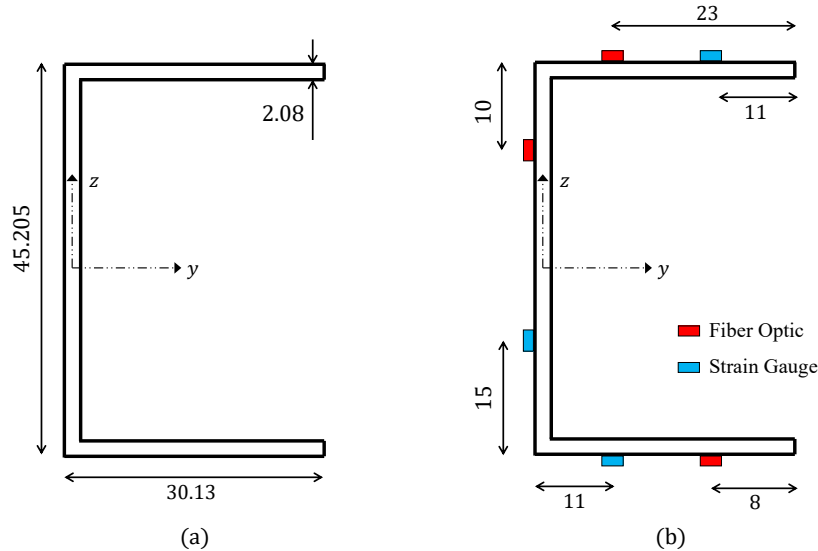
The C beam profile of the aluminium beam specimen: (a) flange dimensions and thickness, and (b) location of the strain sensors (all dimensions are in mm)
